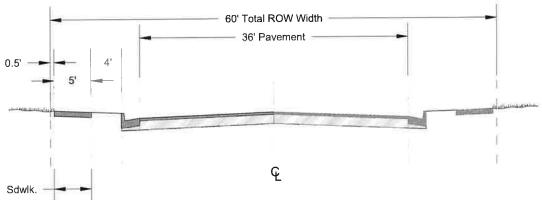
Typical Urban Nonresidential Collector Cross Section
